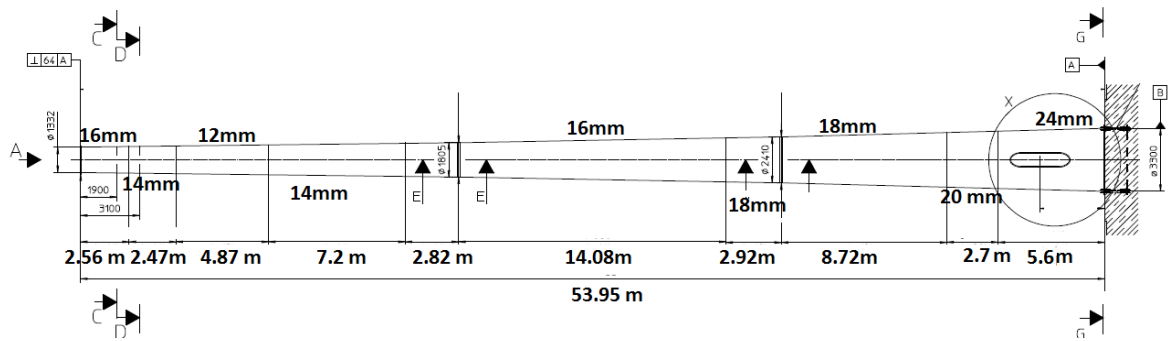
900 kW wind turbine tower and its dimensions.
